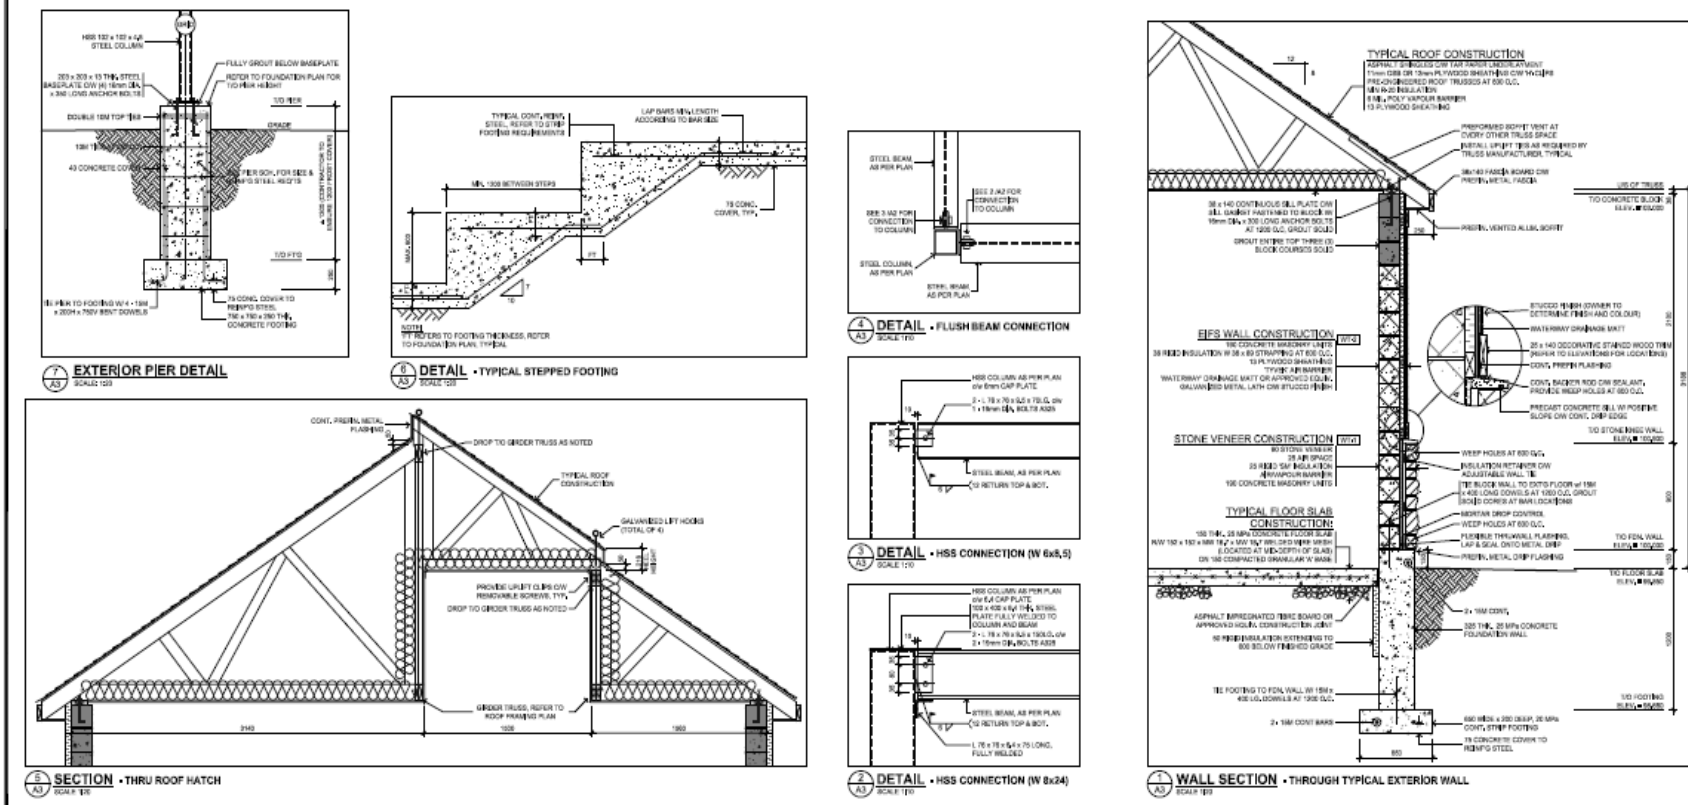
Tacoma Engineers, "Pump House: Sections and Framing Details," 3 Oct. 2012.
